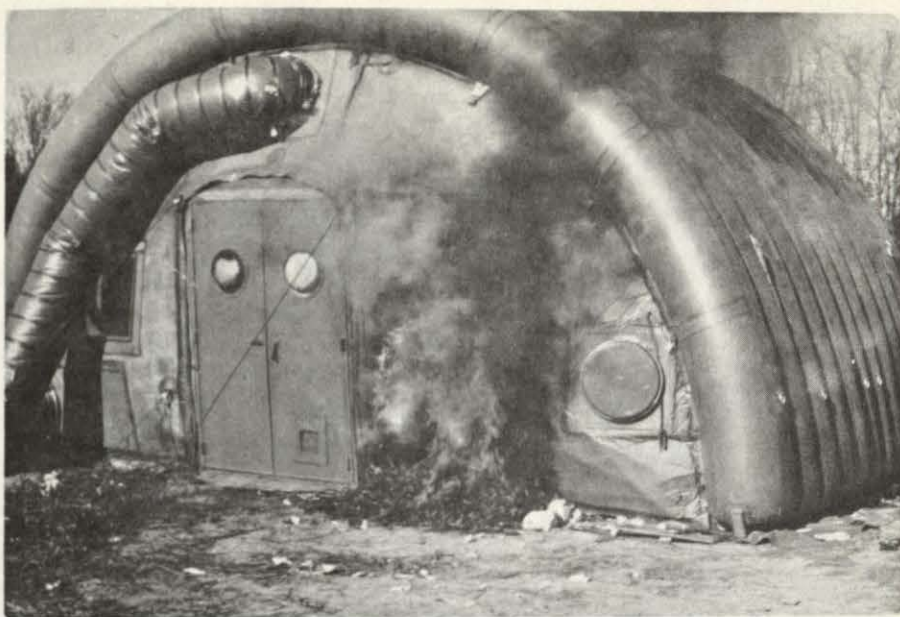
Exterior Fire 1, 6 lbs. of Shredded Newspaper
